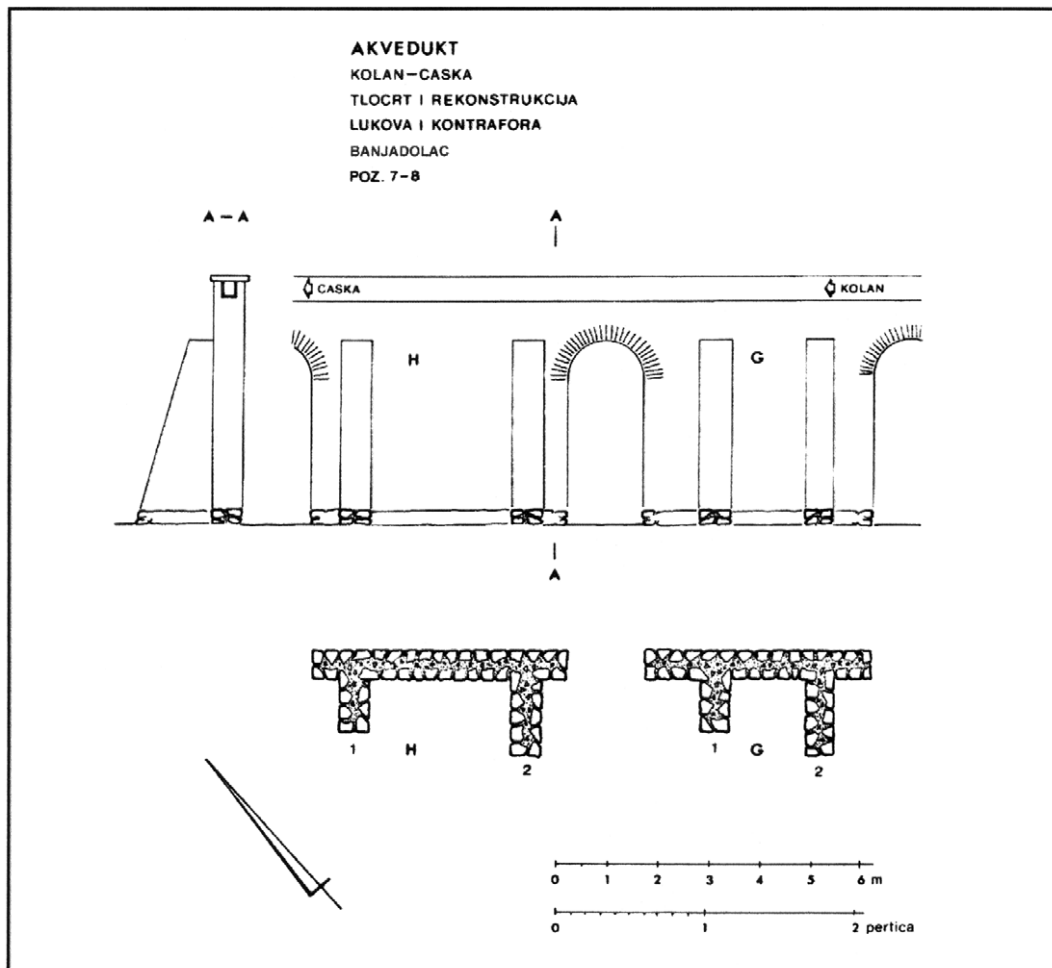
Banjadolac, reconstruction (B. Ilakovac).
